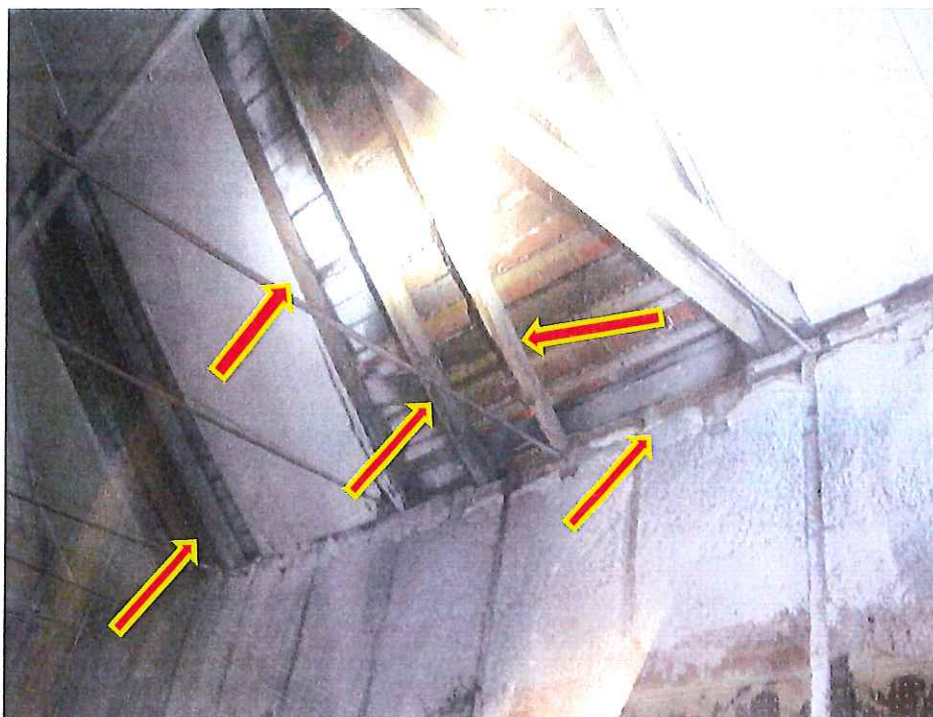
Timber wall plate and rafters decaying, this is typical of most areas at eaves level and in other areas.
